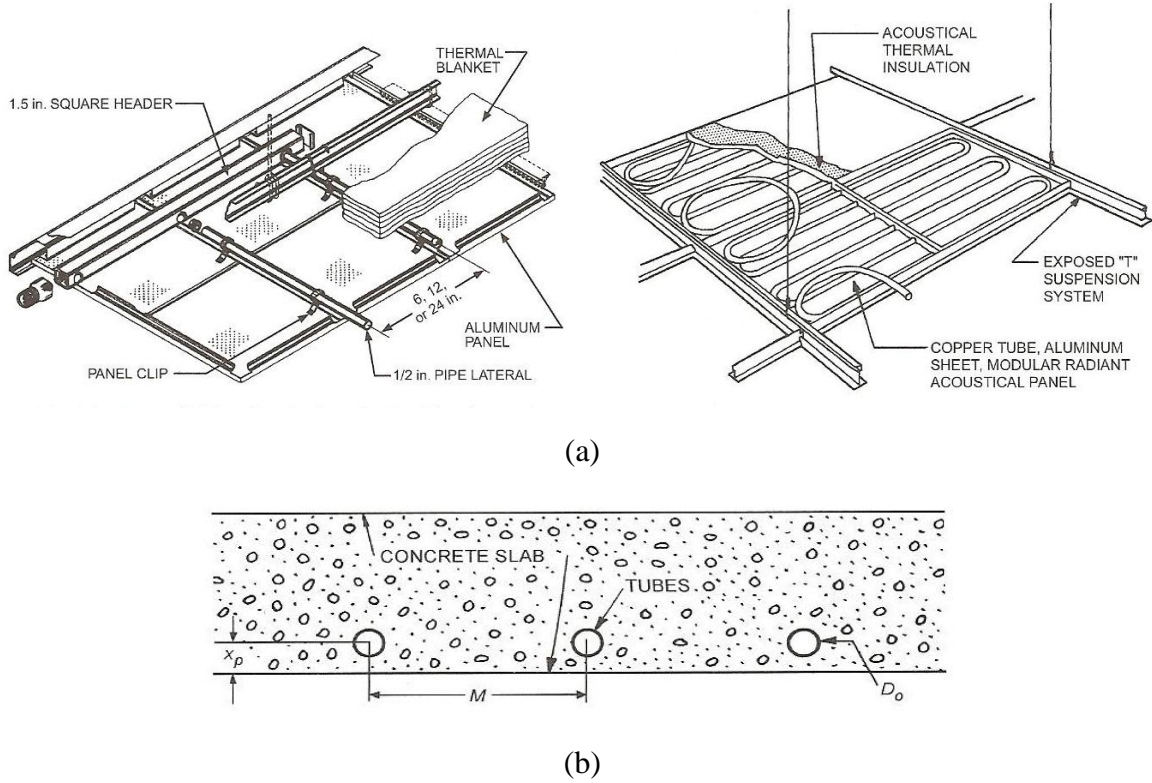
(a) A typical metal ceiling panel with (a) typical piping arrangement and (b) embedded coils in structural concrete slab (Source: ASHRAE, 2008)
